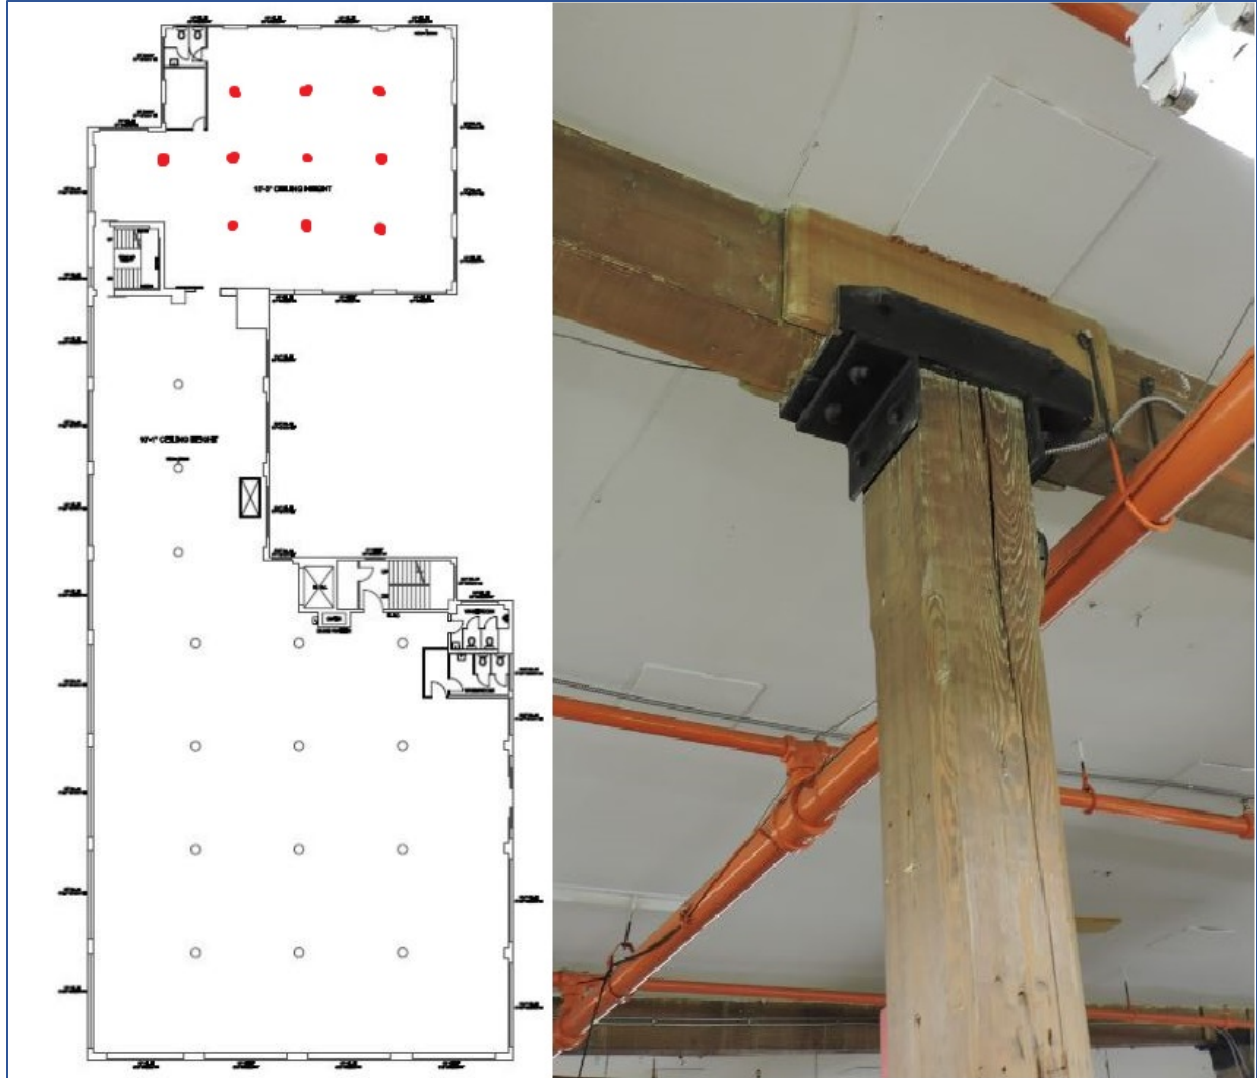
Second level plan with wood pillar support beams marked in red (ZH, 2018).
